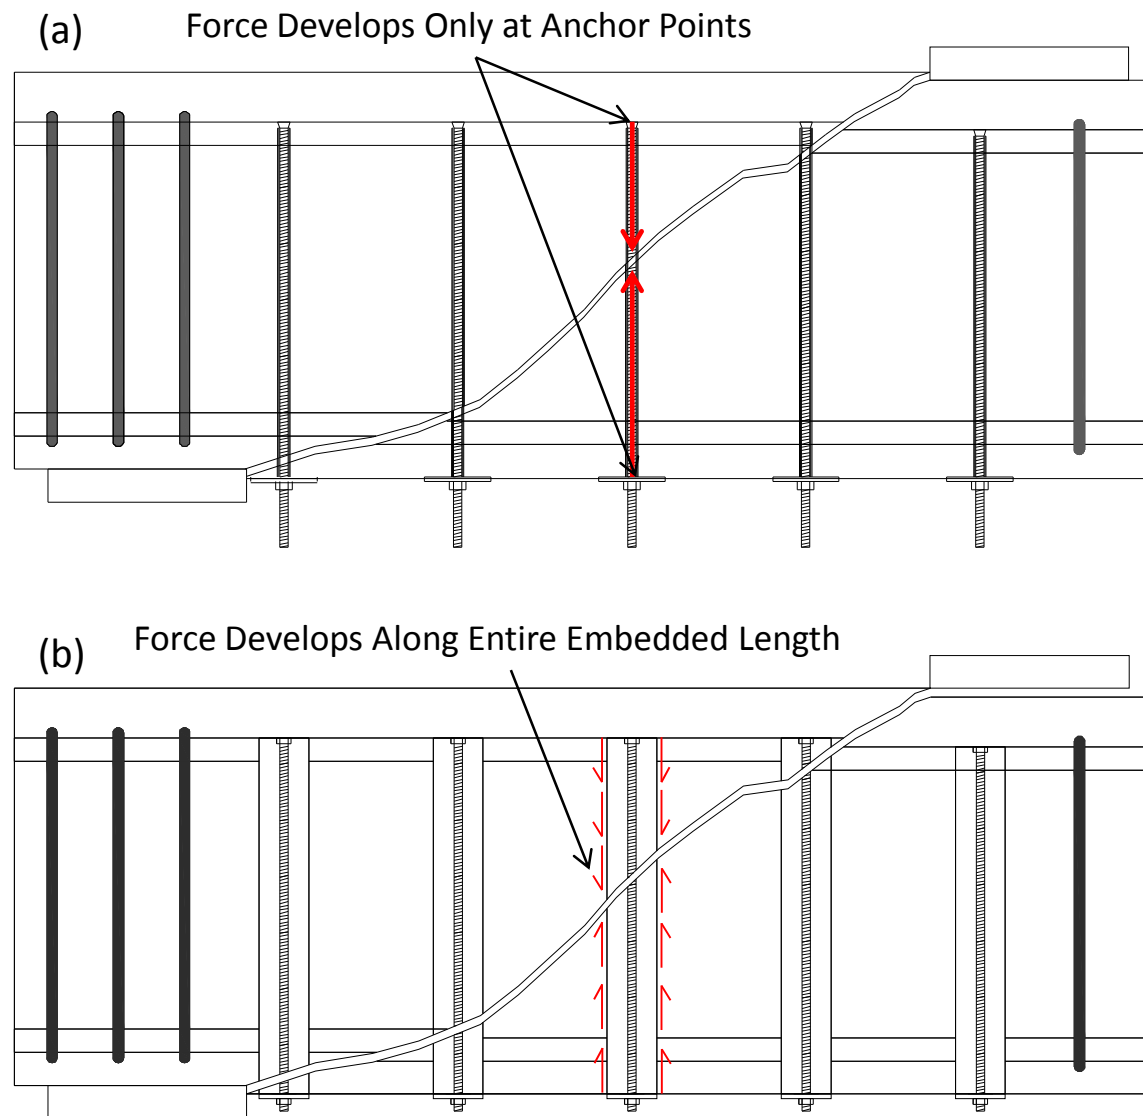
Force development for post-installed reinforcement methods. (a) undercut anchors; (b) grouted anchors.
